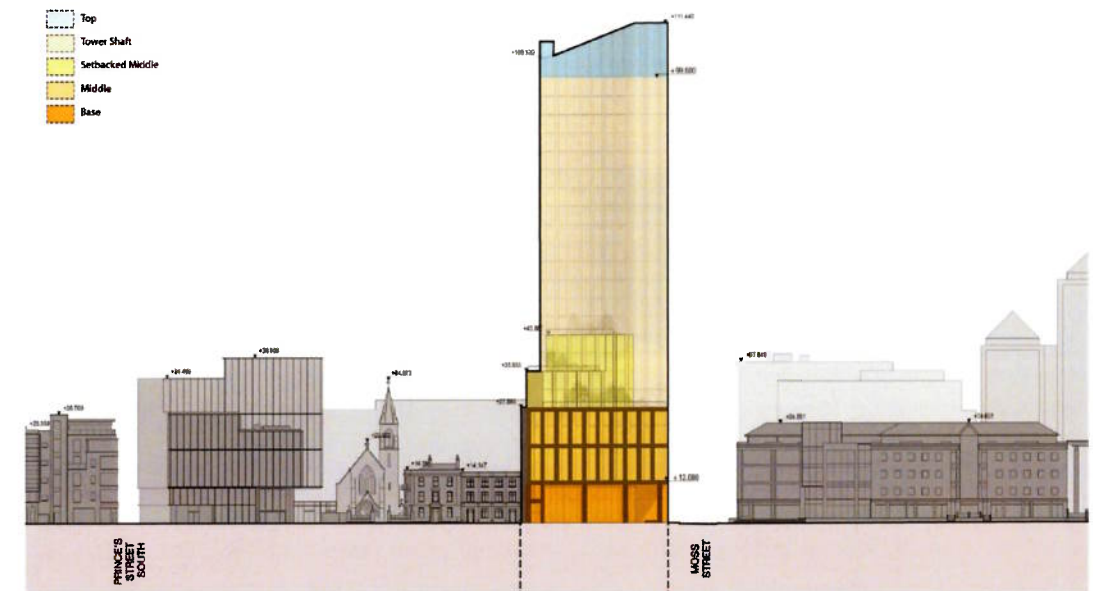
Elevation of Proposed Building's Base and Mid-Section along City Quay
